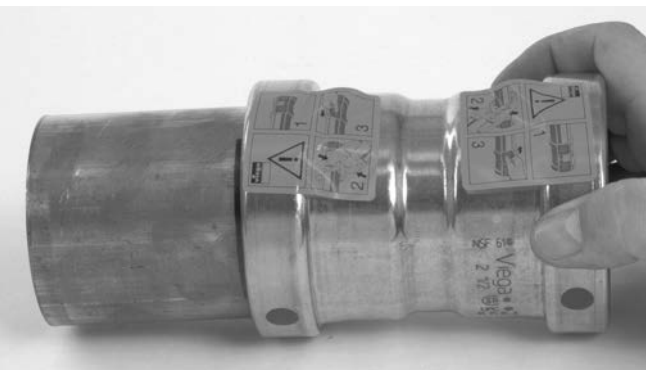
Marking the Tube Before Inserting Into Fitting
